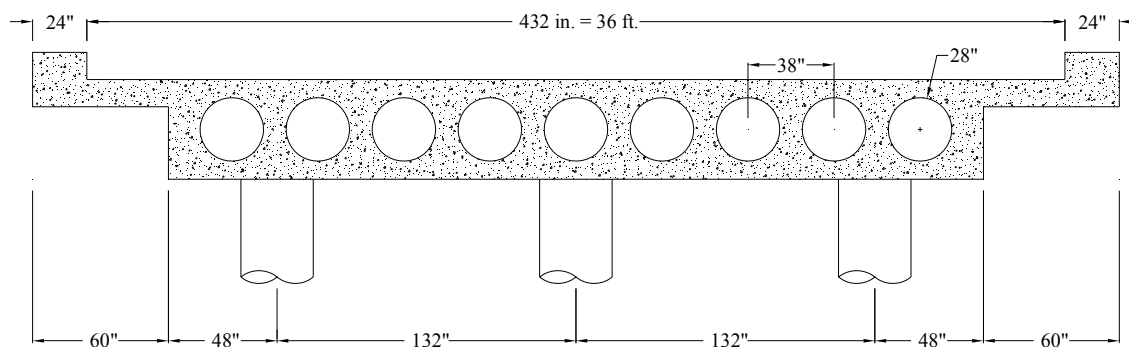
Cross Section of the Superstructure of the Modeled Bridges
